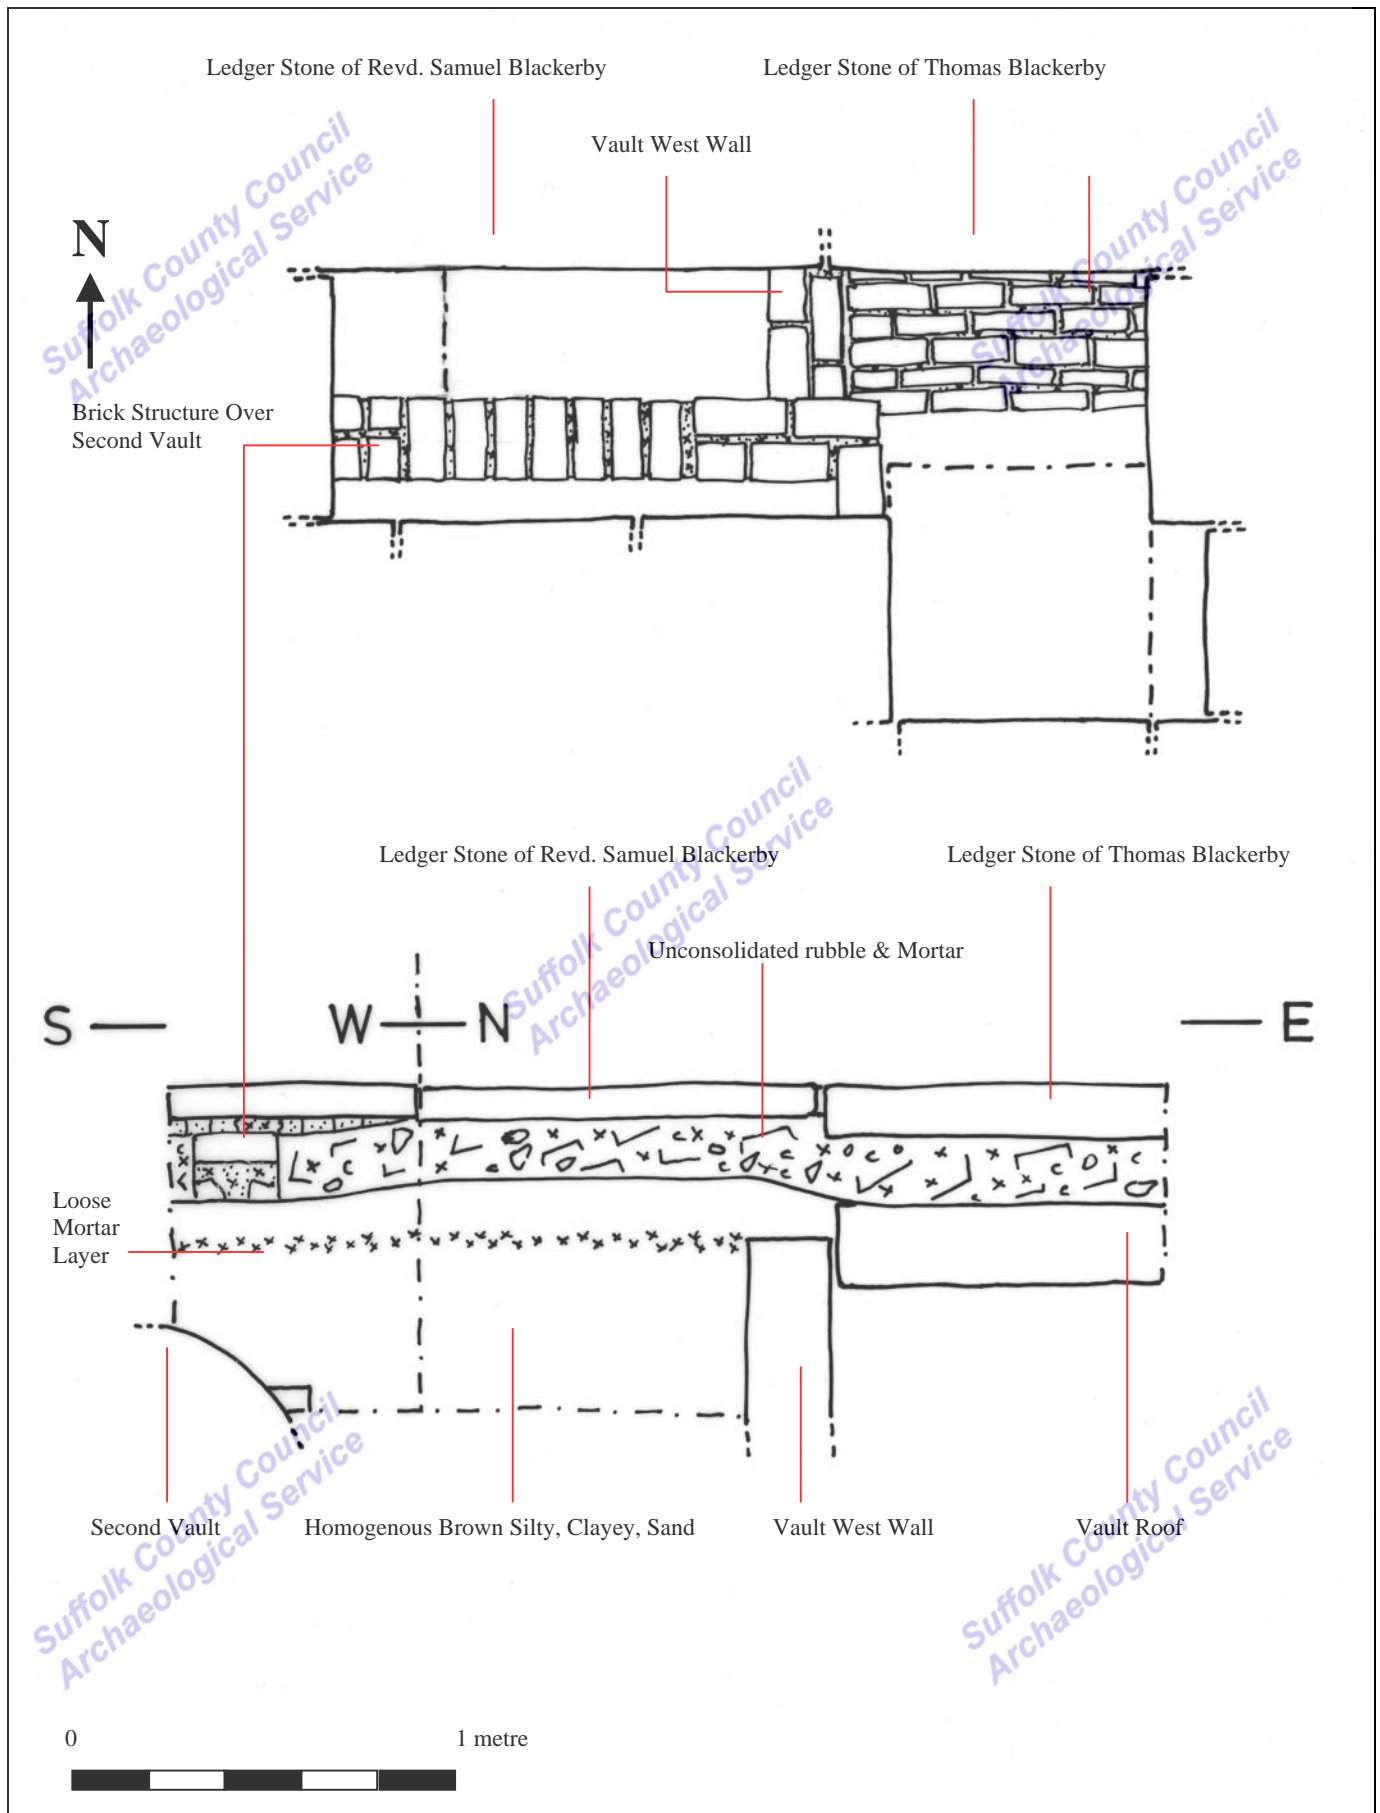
SKT 015, 1:20 Scale Plan & Section Drawings
